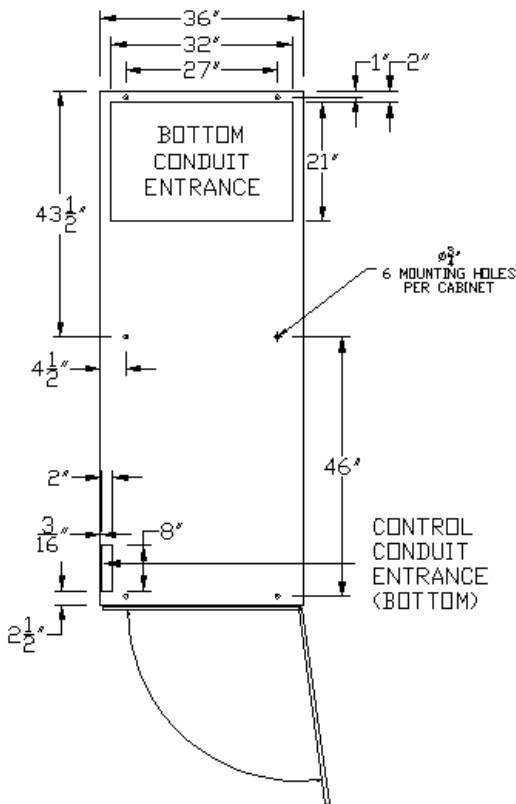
Traditional Switchgear Single Section Dimensions (rear access required)
